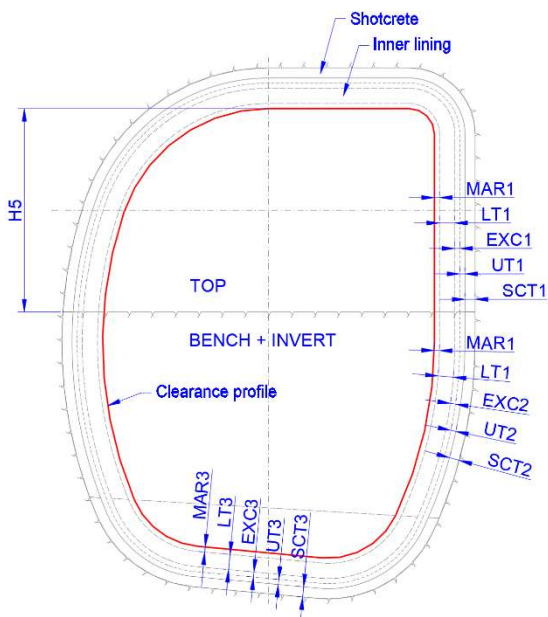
Cross section Type 6, phase 1 and 2/3 excavation (EXPH=3)
